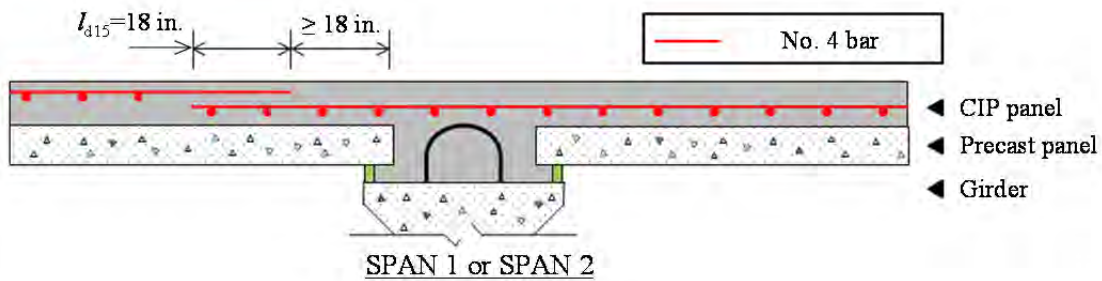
Details of transverse splice, Lampasas River Bridge (Section R-R)
